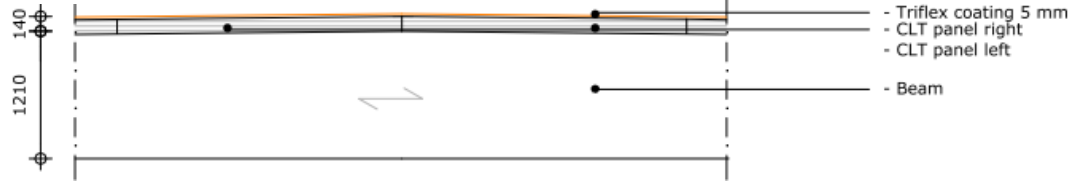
Tapered beam layout with centre CLT panels in mm
